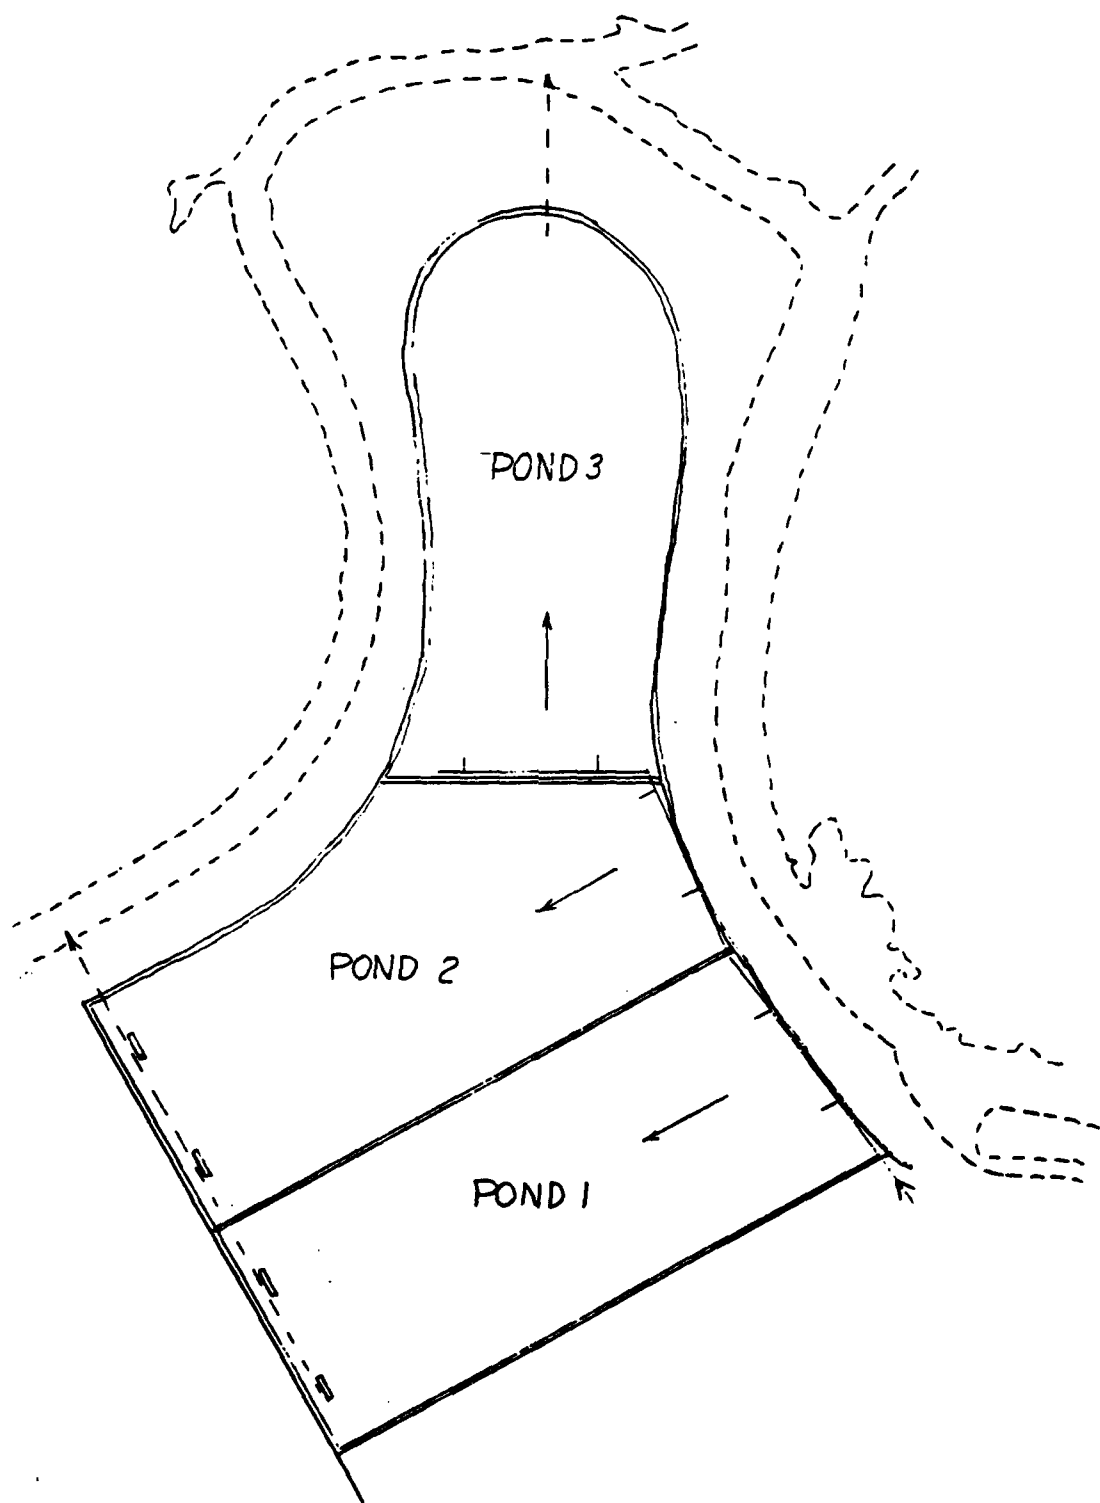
SEDIMENT DISPOSAL POND CONFIGURATION
